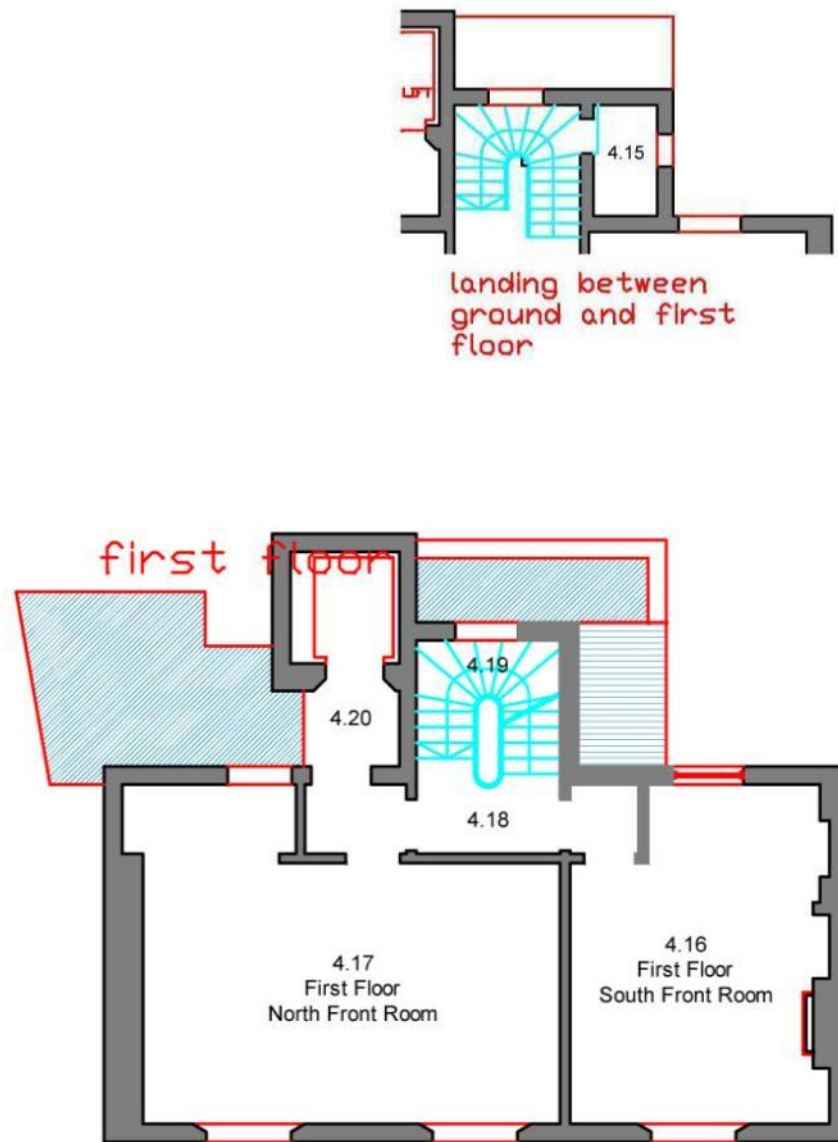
; First Floor and Landing between Ground and First Floor, room labels relating to report
